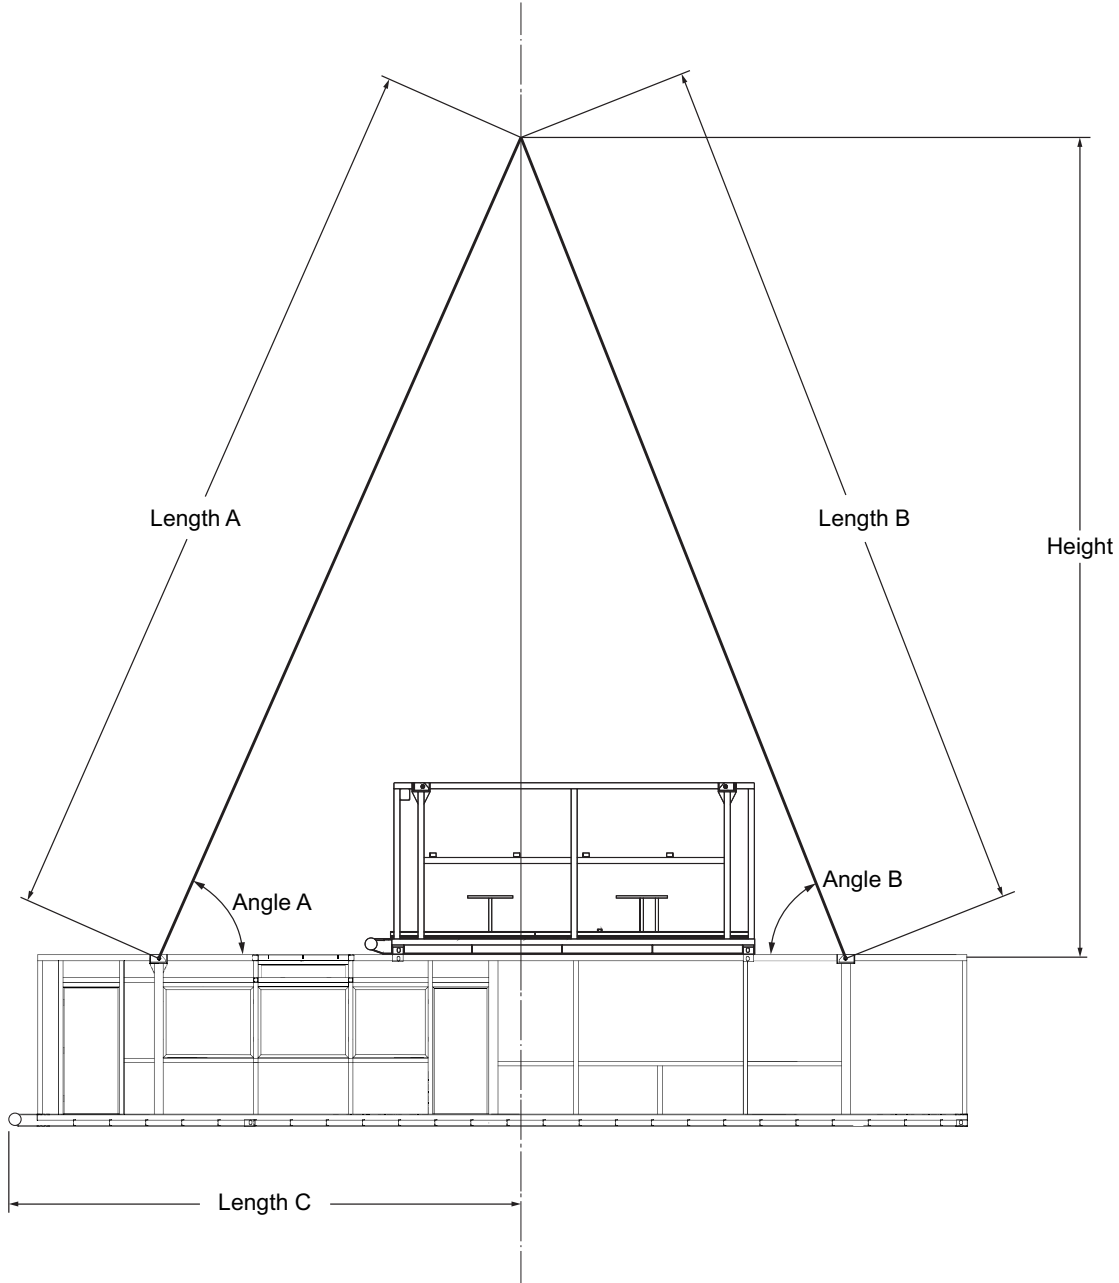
Typical Lifting Arrangement for a Driller's Cabin where the Center of Gravity is NOT at the center of the building
